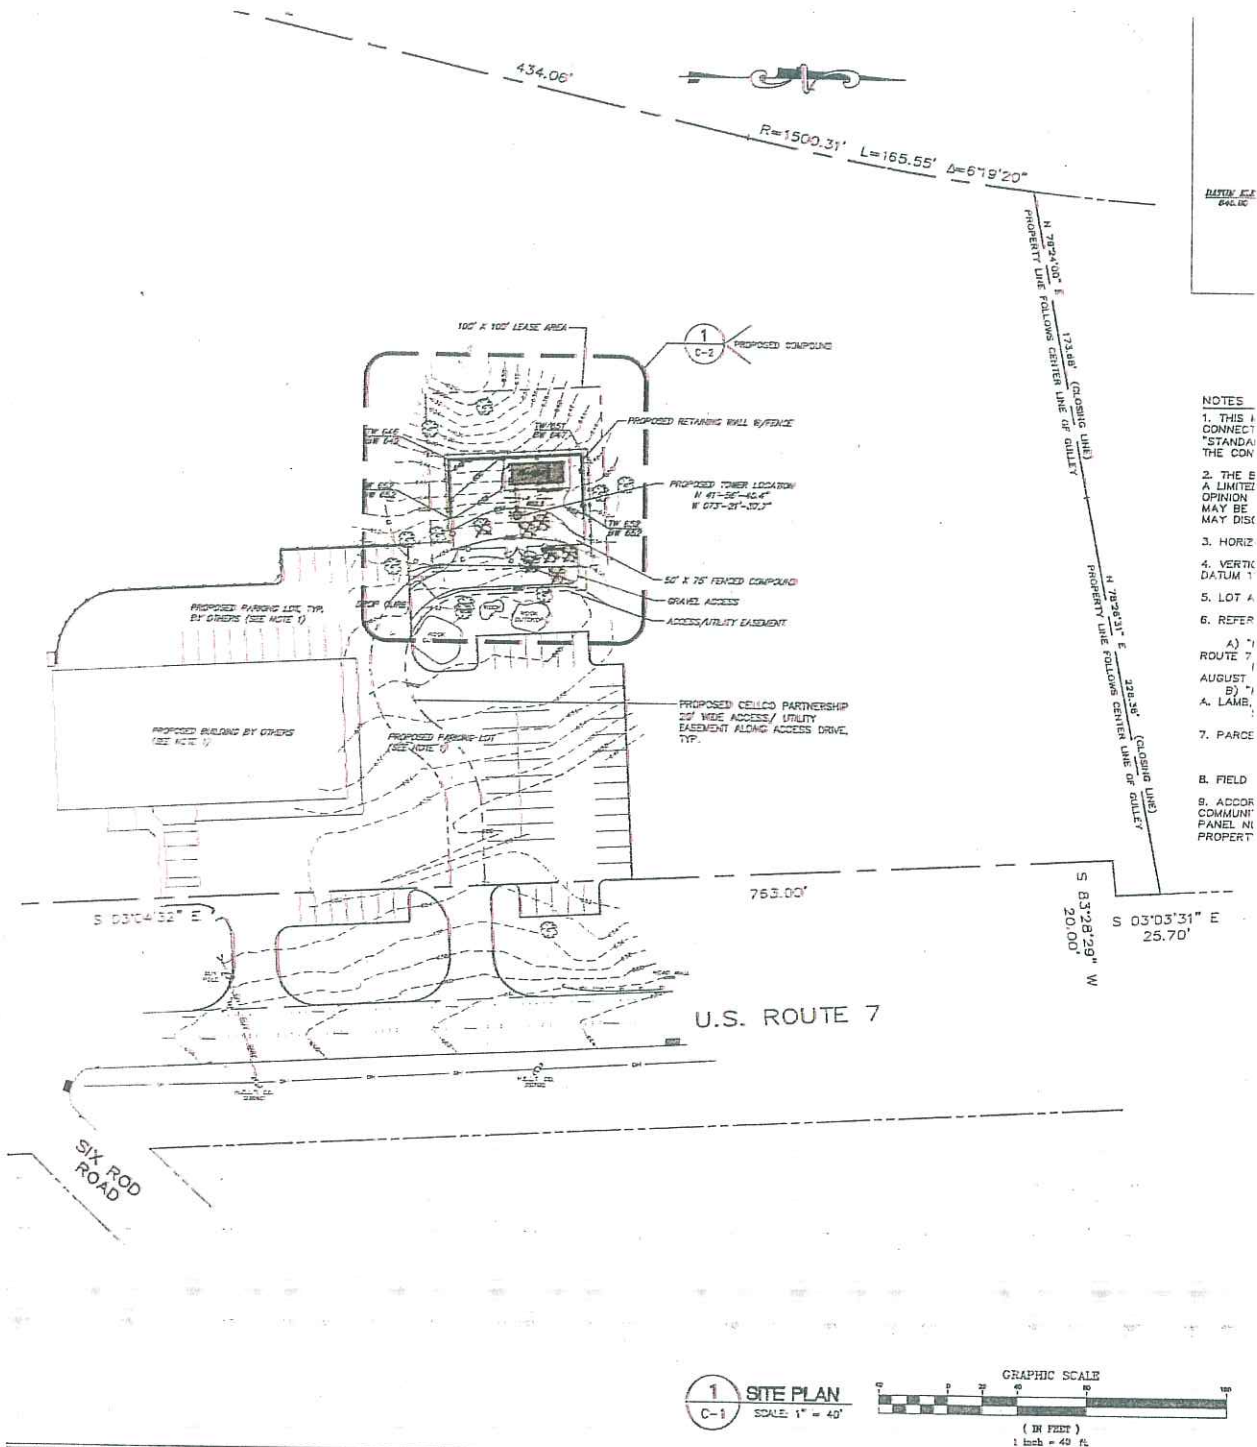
Site plan for proposed site. (Verizon 1, Tab 1)
